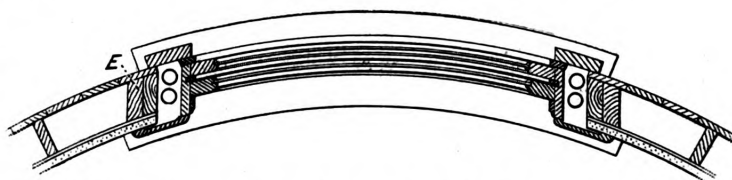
Horizontal Section through Window Frame, Sash and Tower Wall, Showing Method of Setting Jamb Studding.—Scale, $\frac{3}{4}$ inch to the Foot.
